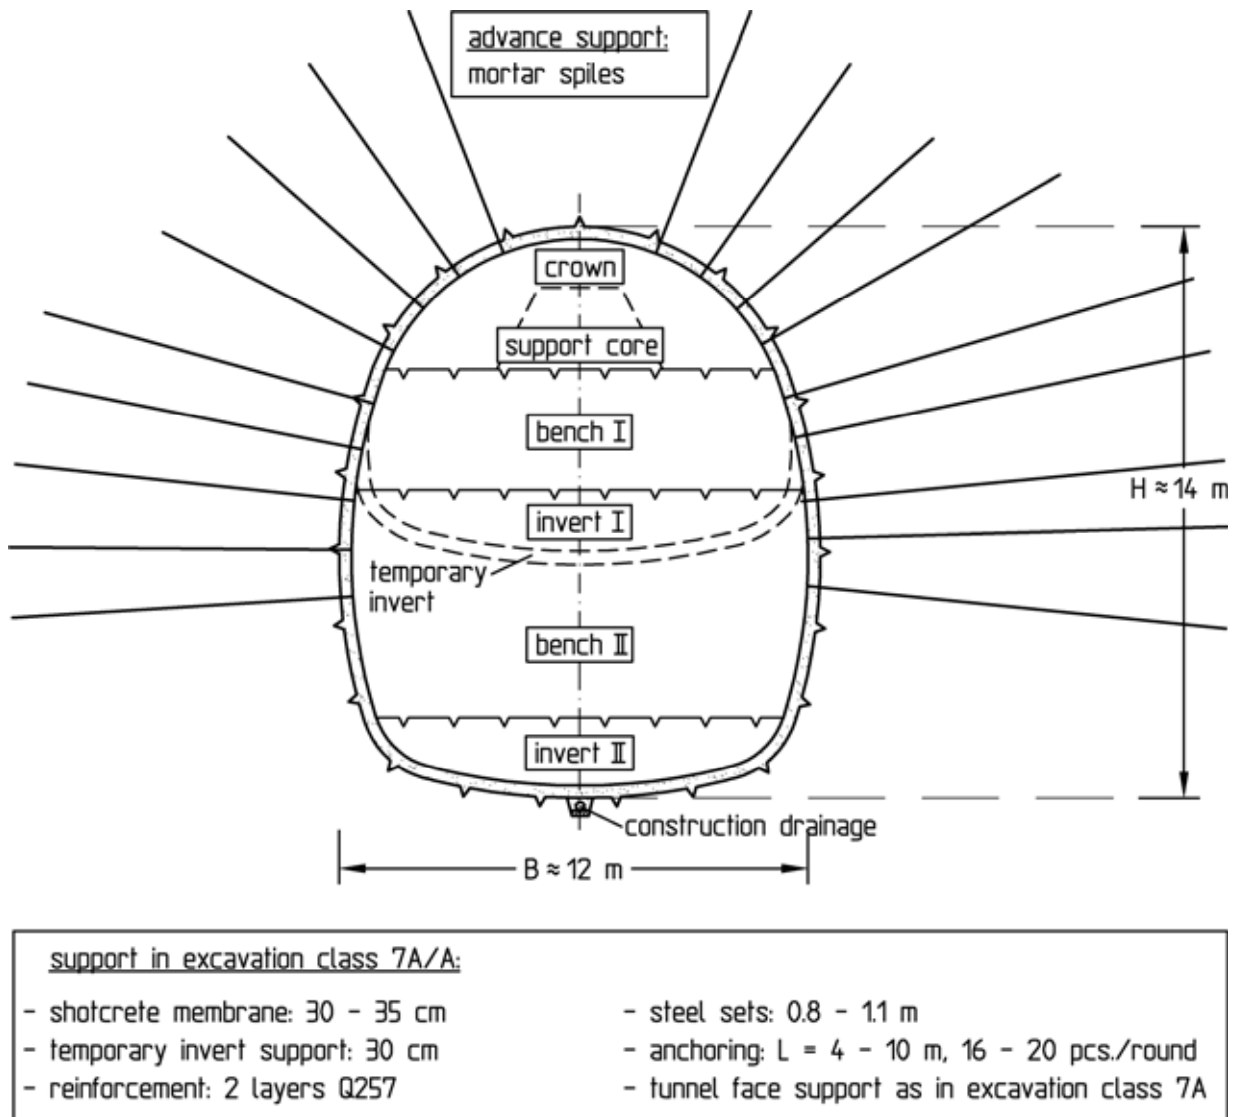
Excavation and support, maximum cross-section, lowering of the invert, cross-section
